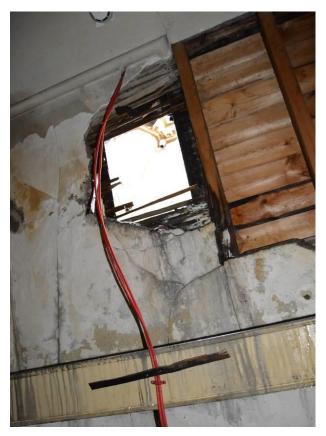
View above the landing F1. Scale 2m. Facing north west.
